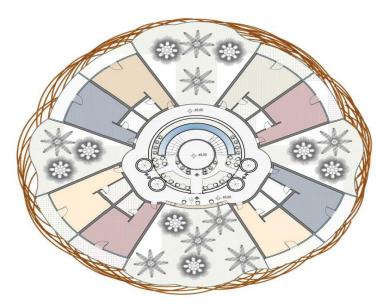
Plan of the floor with one capsule - there is one central internal elevators and four high-speed external elevators.
